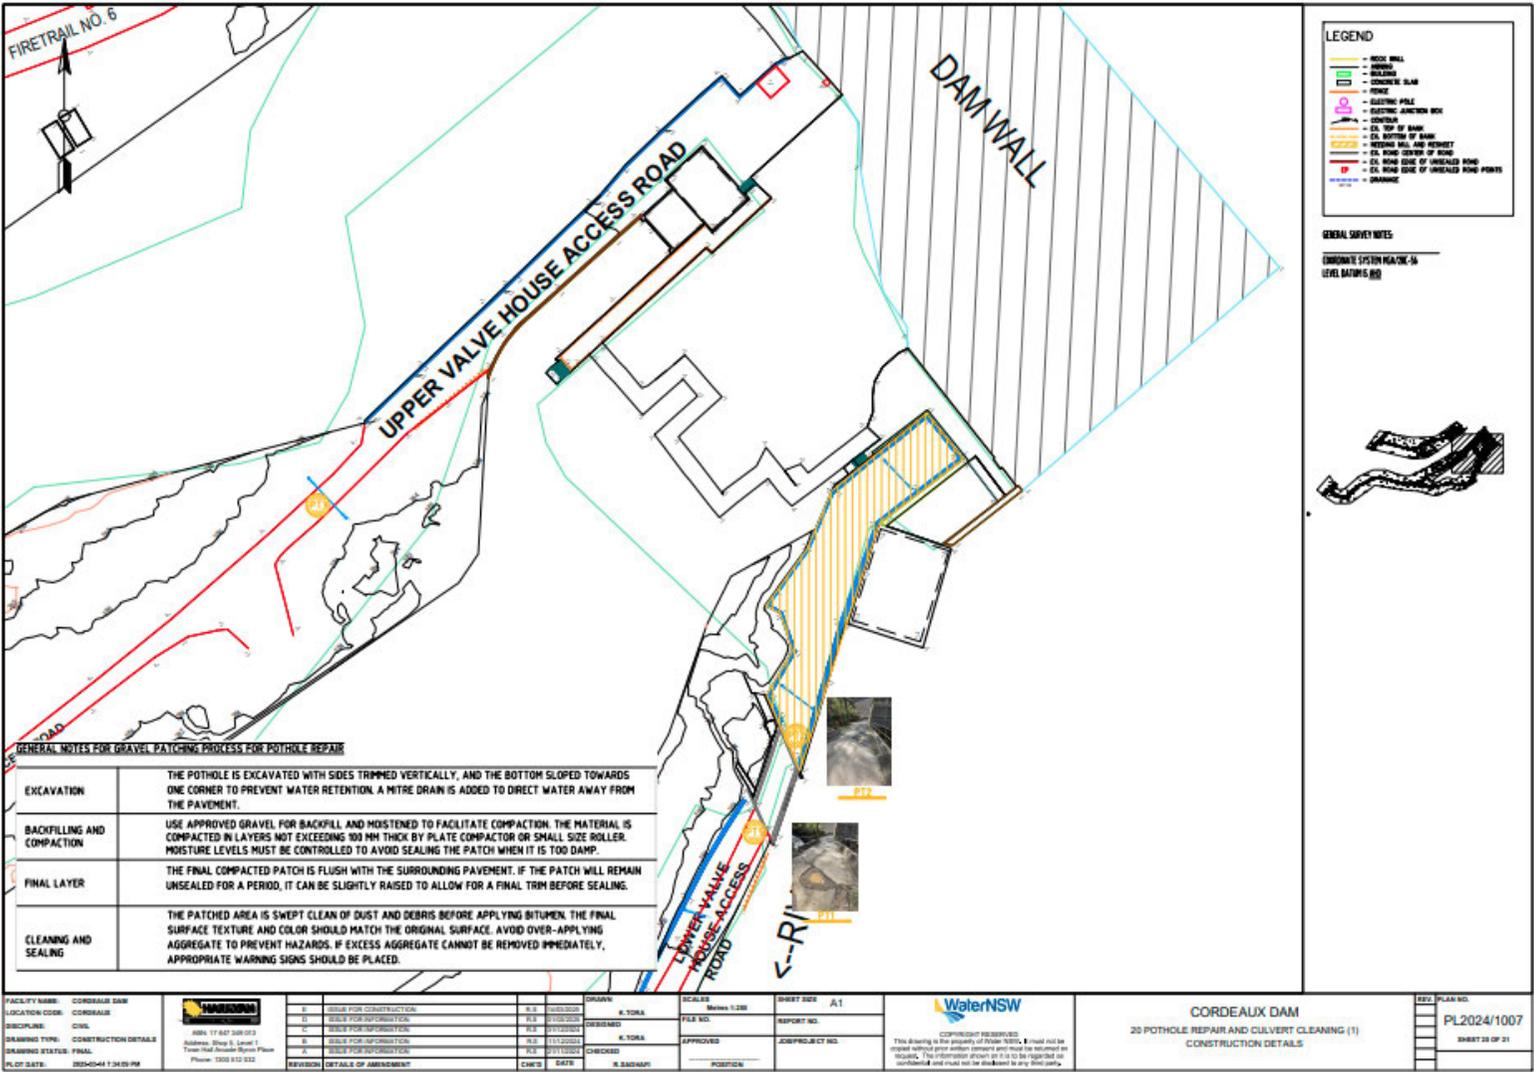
Pothole repair and culvert cleaning in Area 5 (Source: Cordeaux Dam Construction Drawings, Water NSW)
